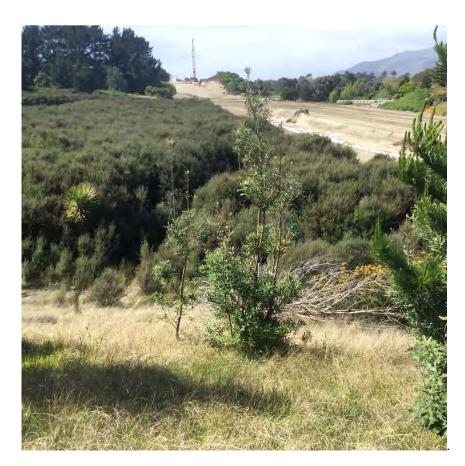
El Rancho Wetland photopoint 1. Looking from M2PP expressway road West into Manuka stand. Note this photopoint has relocated to a position which will record a greater amount of change
